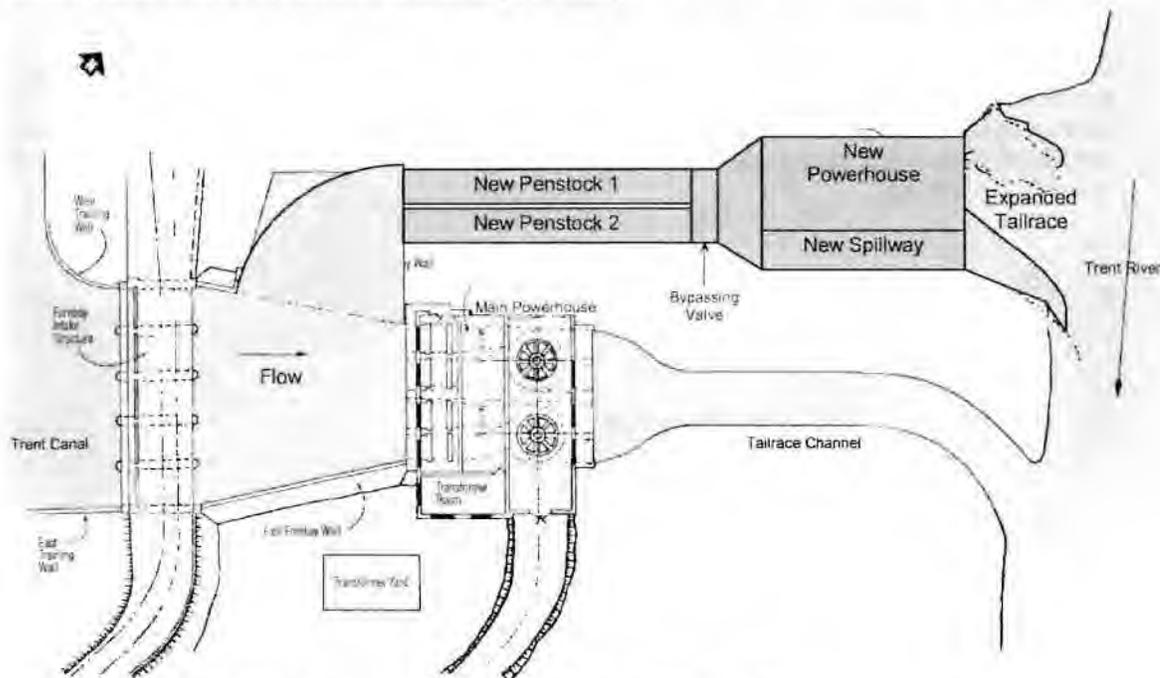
Ranney Falls G3 Proposal with penstocks and short tailrace
